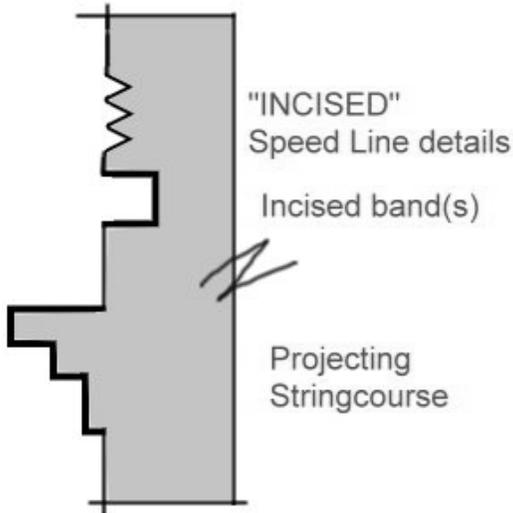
Shown in cross-section thru a building wall, horizontal rhythms can be created by “incised” lines the recede into the wall surface or by projecting elements, that extend beyond it.
